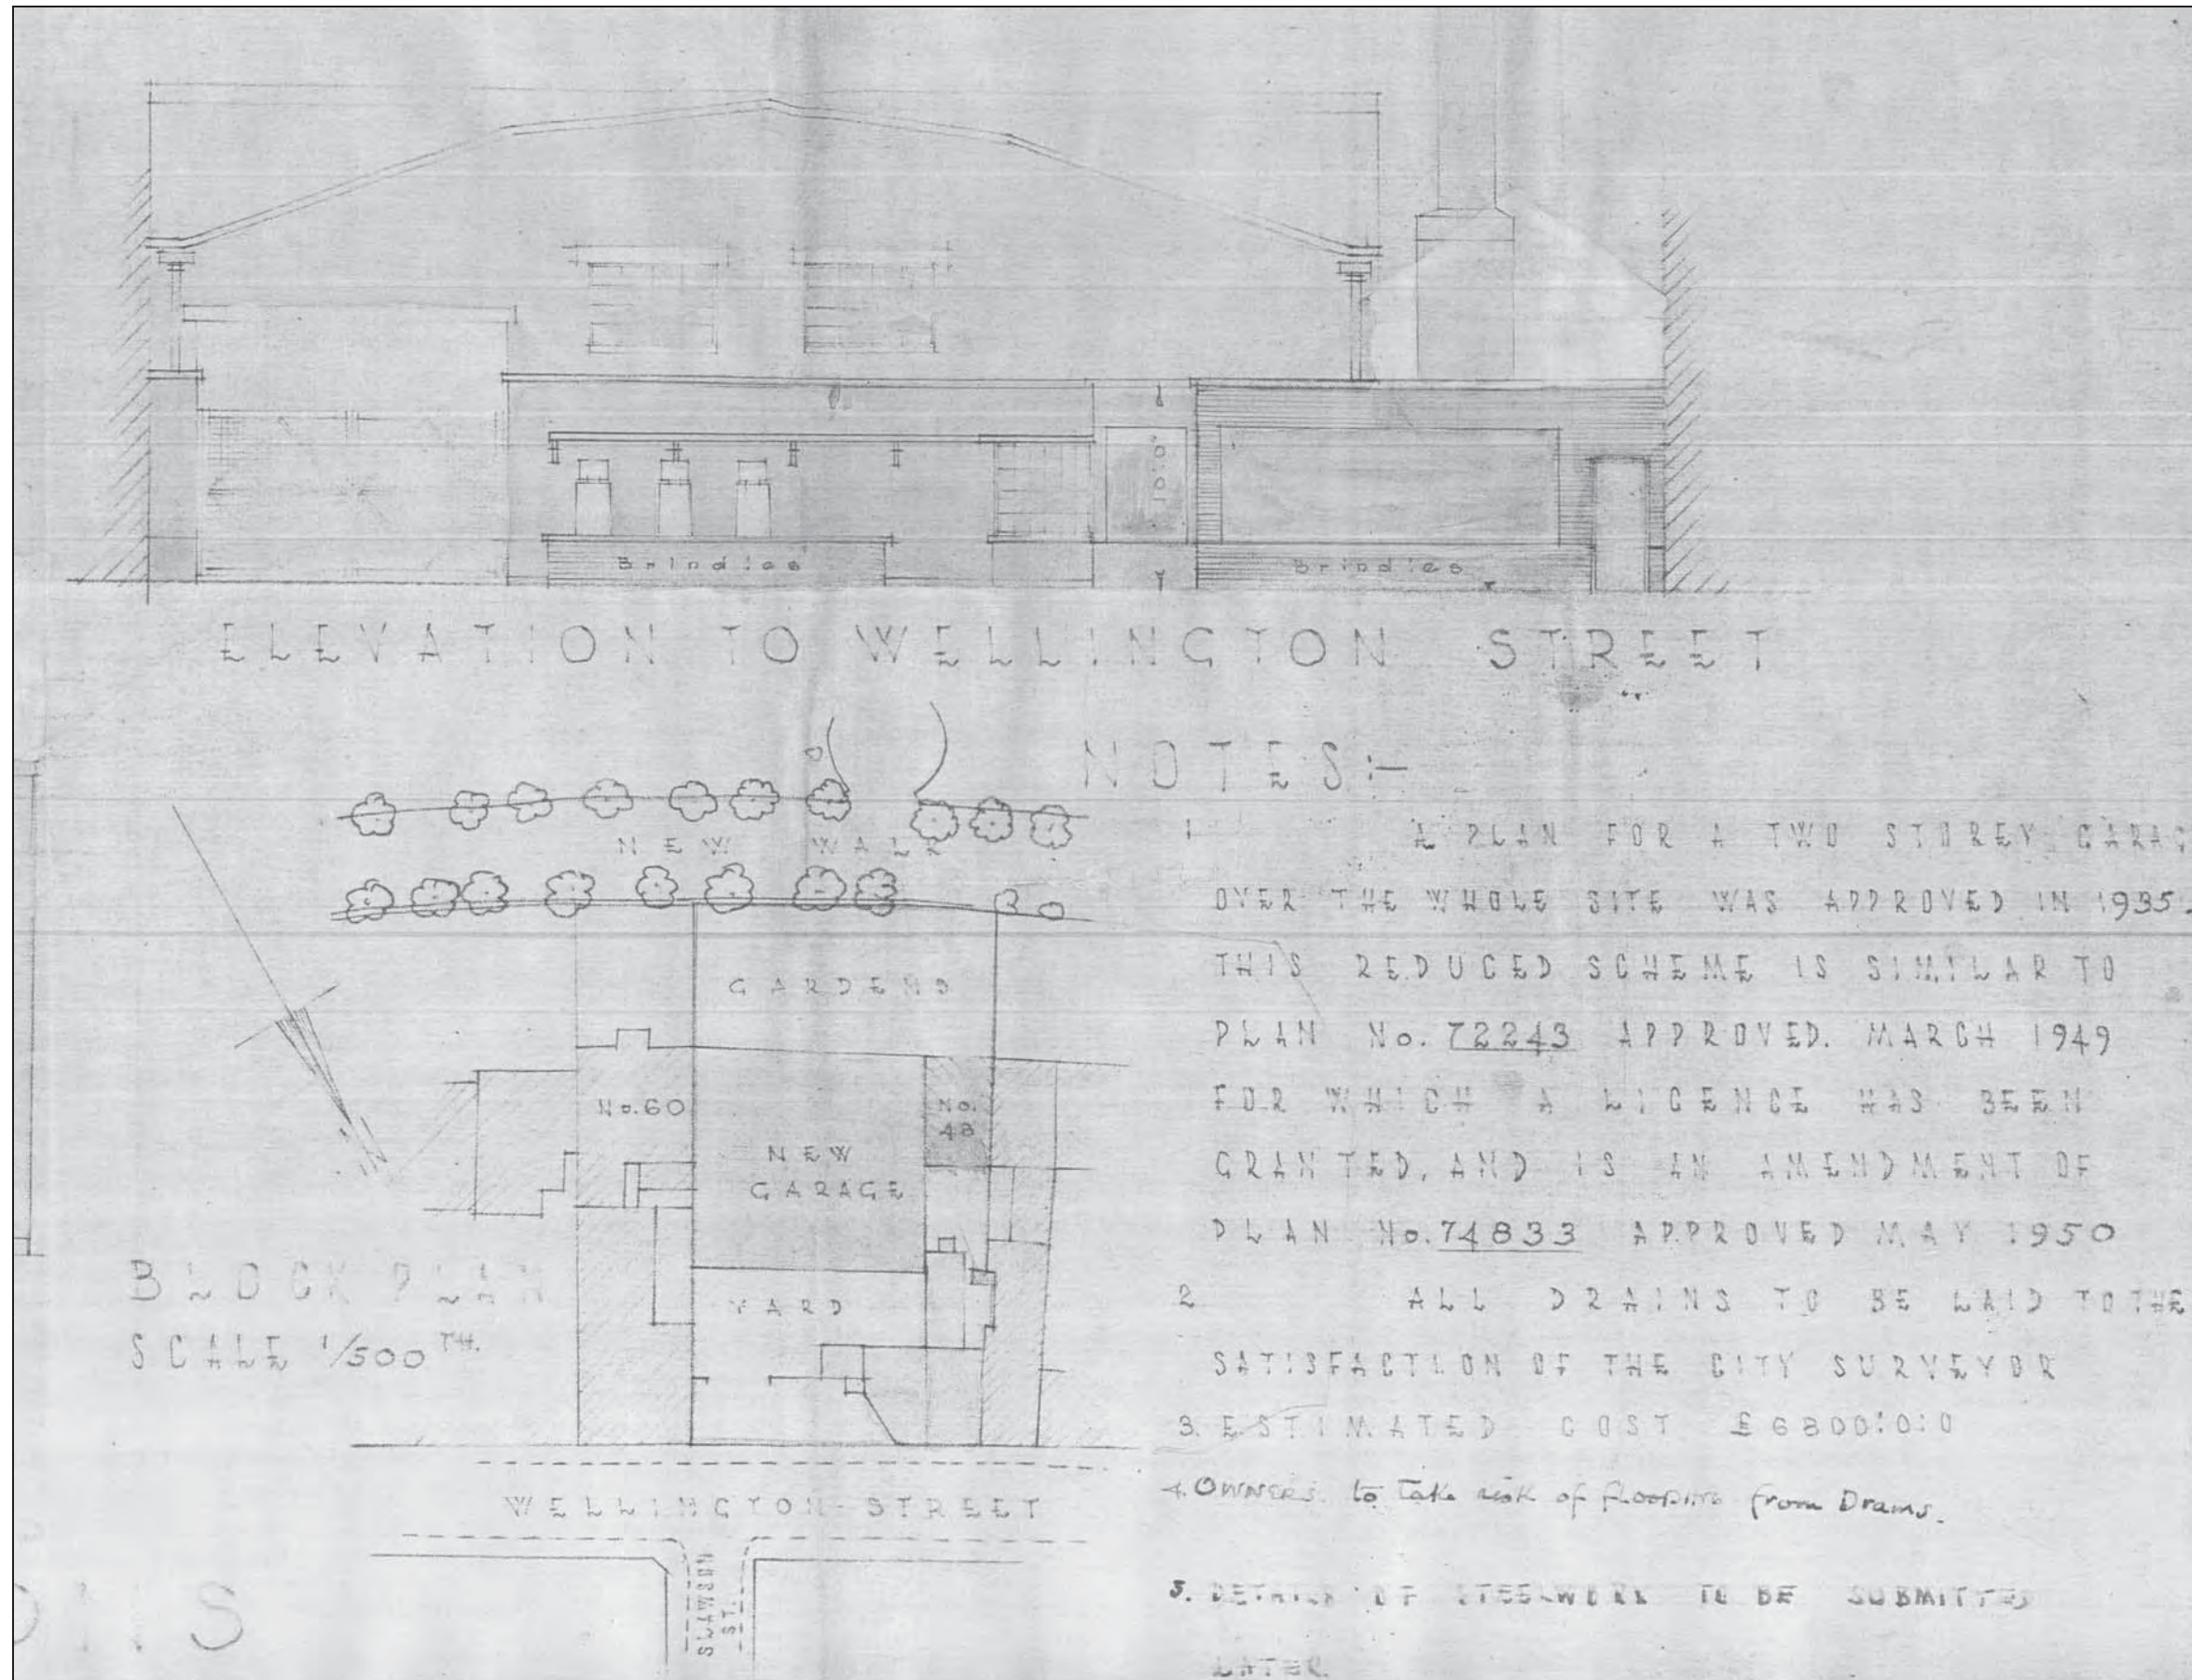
Wellington Street Elevation and Block Plan of Sibson's Garage (Stockdale Harrison & Sons, 1951; taken from LBR Plan 76644)
